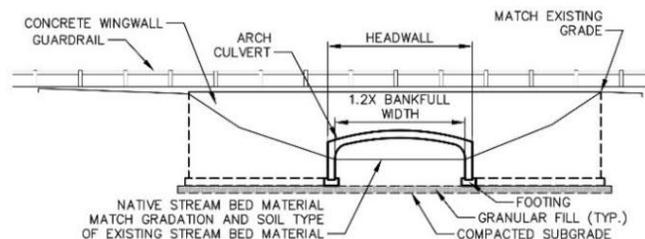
Typical detail of an open arch culvert designed to meet MA Stream Crossing Standards.
